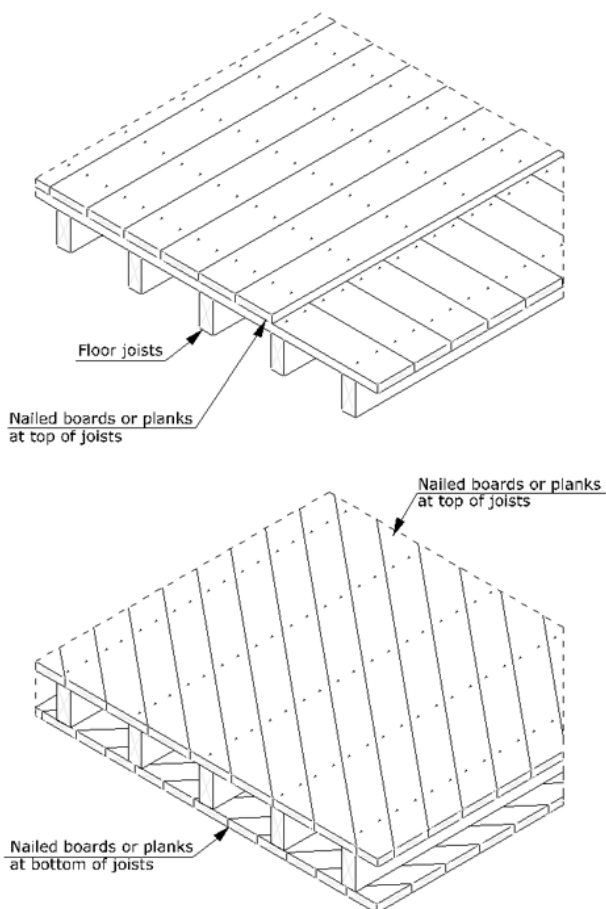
a Stiffening of timber floors by nailing boards or planks
